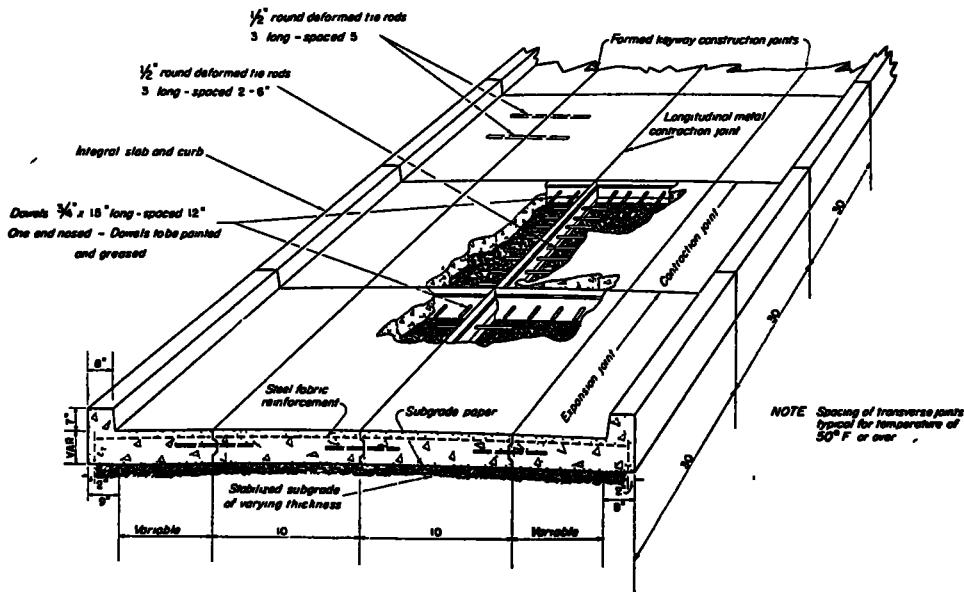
District of Columbia Recommended Design of Reinforced Portland Cement Concrete Pavement
